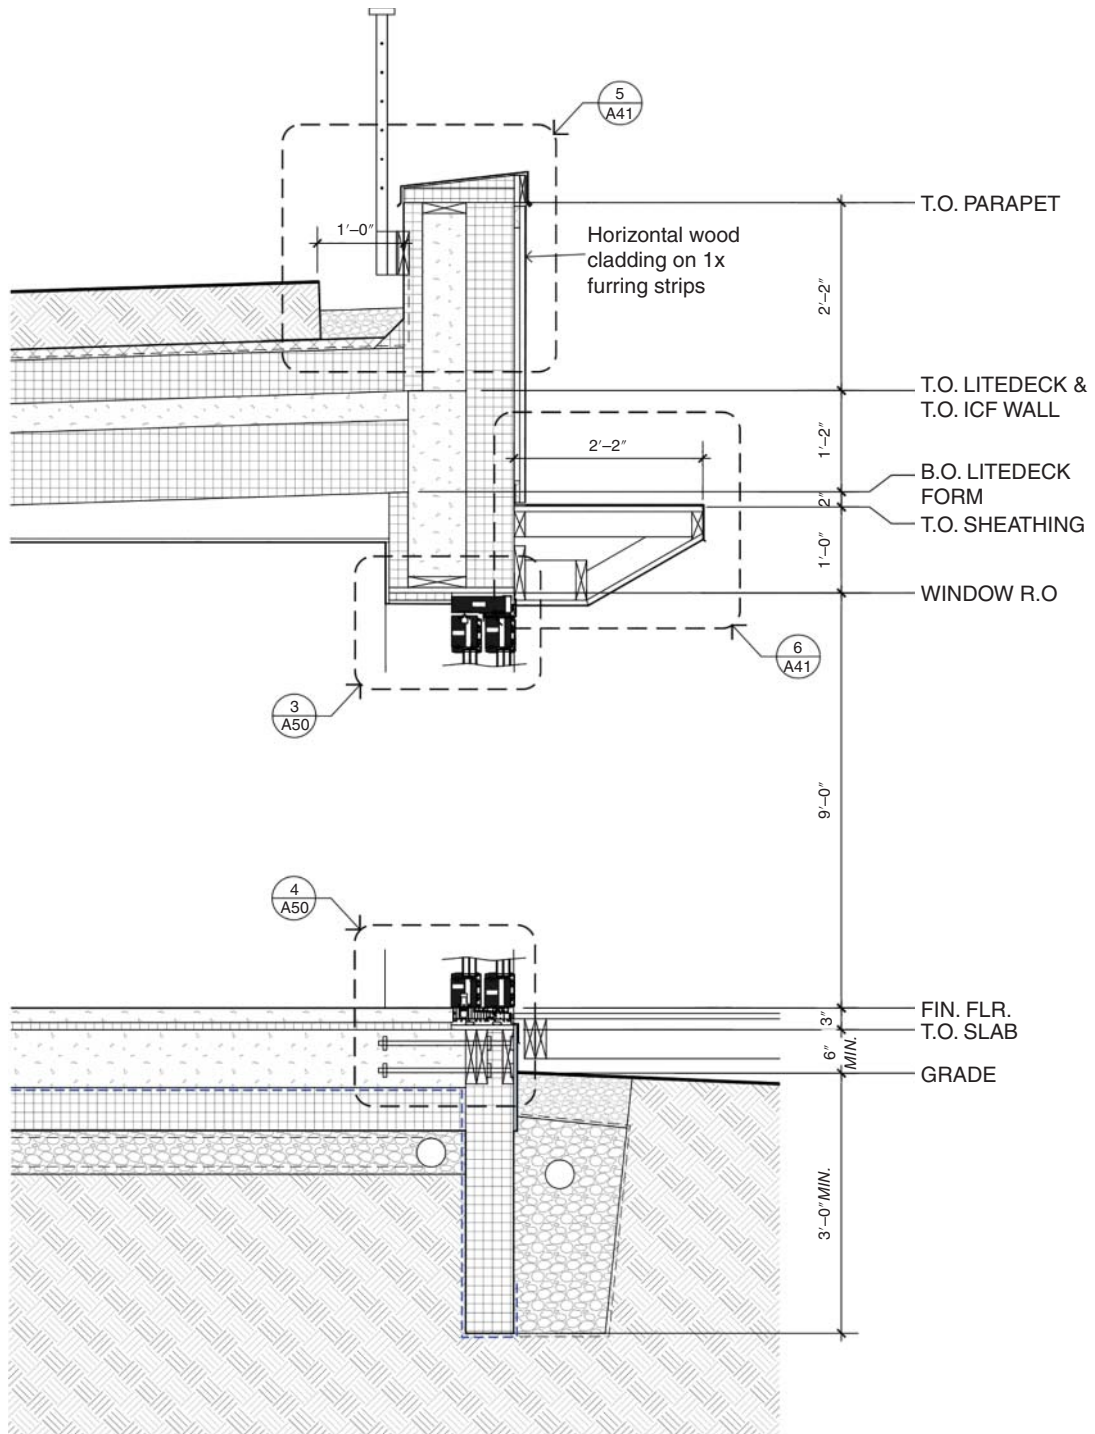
During design development, construction details converting an idea into a building evolve. This drawing illustrates the development of working details for the enclosure used in the IOWA Nest, resulting in an insulated enclosure: R-28 slab, R-45 walls, and an R-70 roof. (© Sterner Design, LLC; used with permission.)
